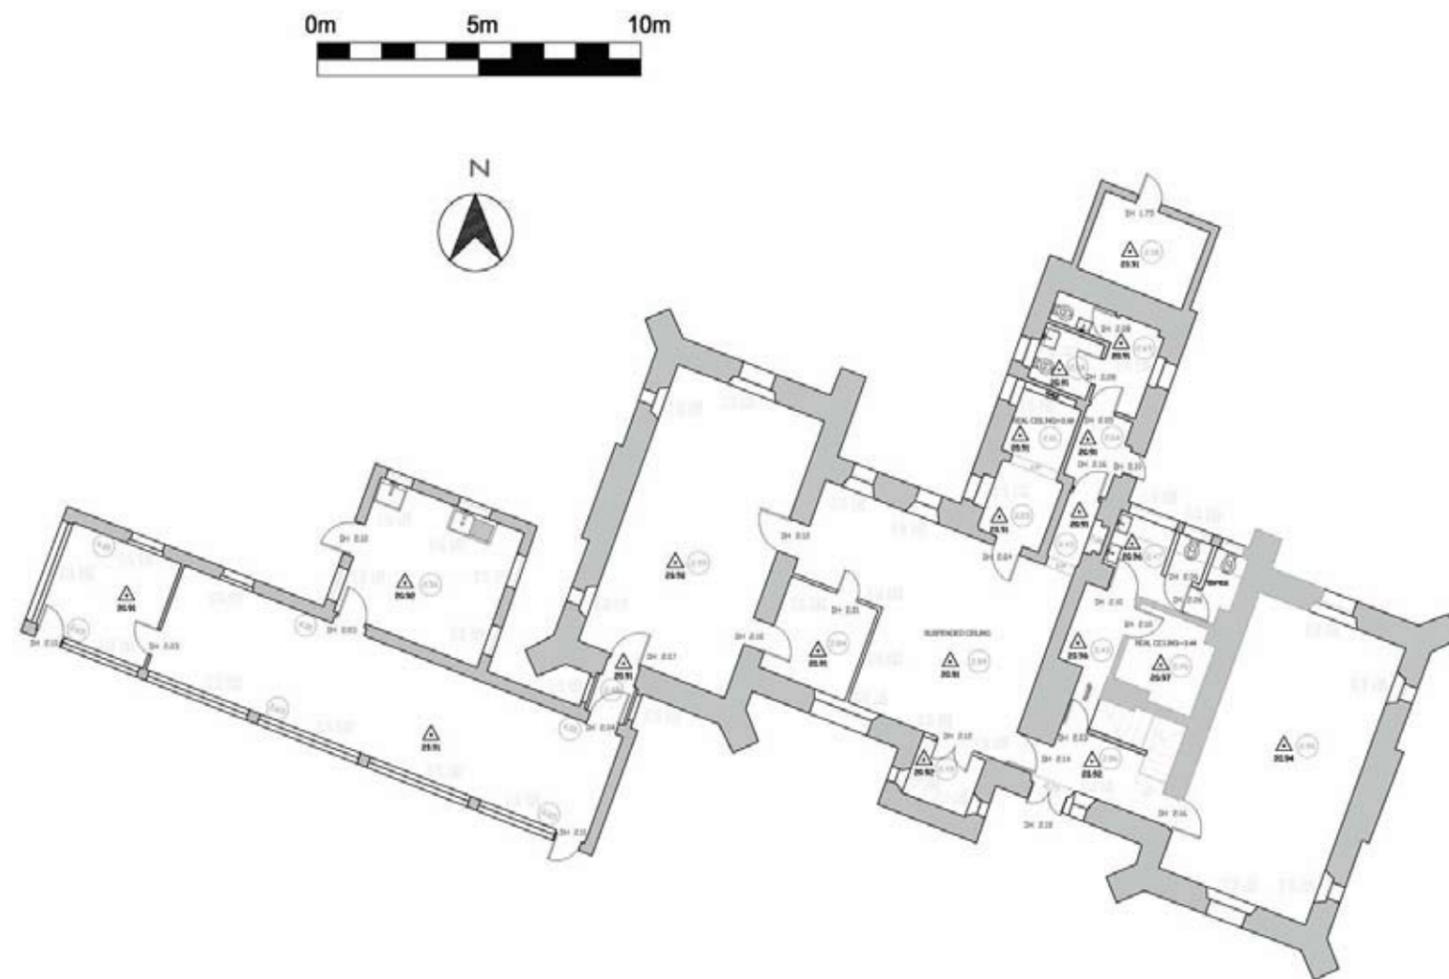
6: Ground floor plan of male infirmary as existing from survey
